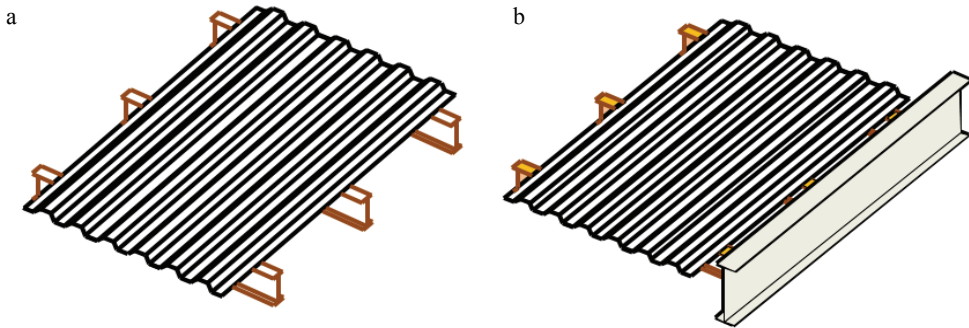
a – Steel beams supporting corrugated steel sheets; b – supporting beams rested on steel girders
